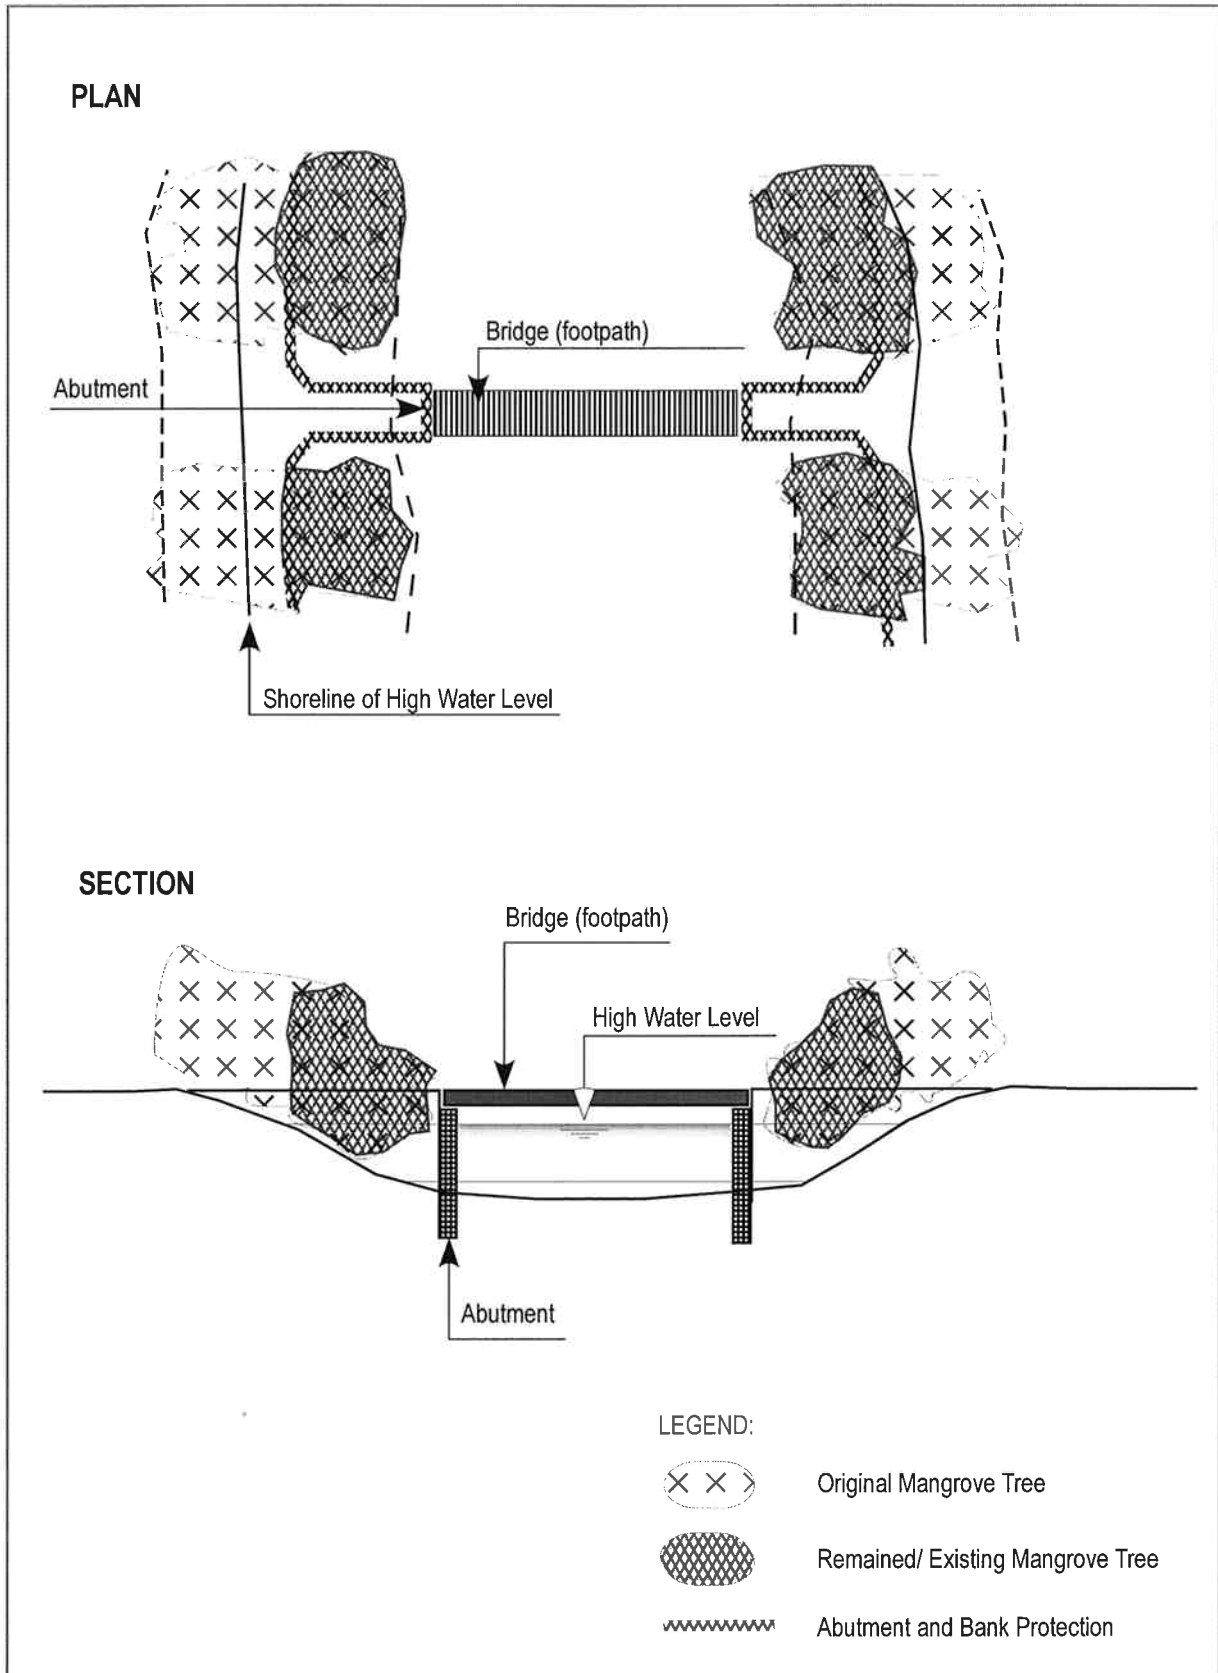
The Existing Pedestrian Bridge at Khawr Shinas
